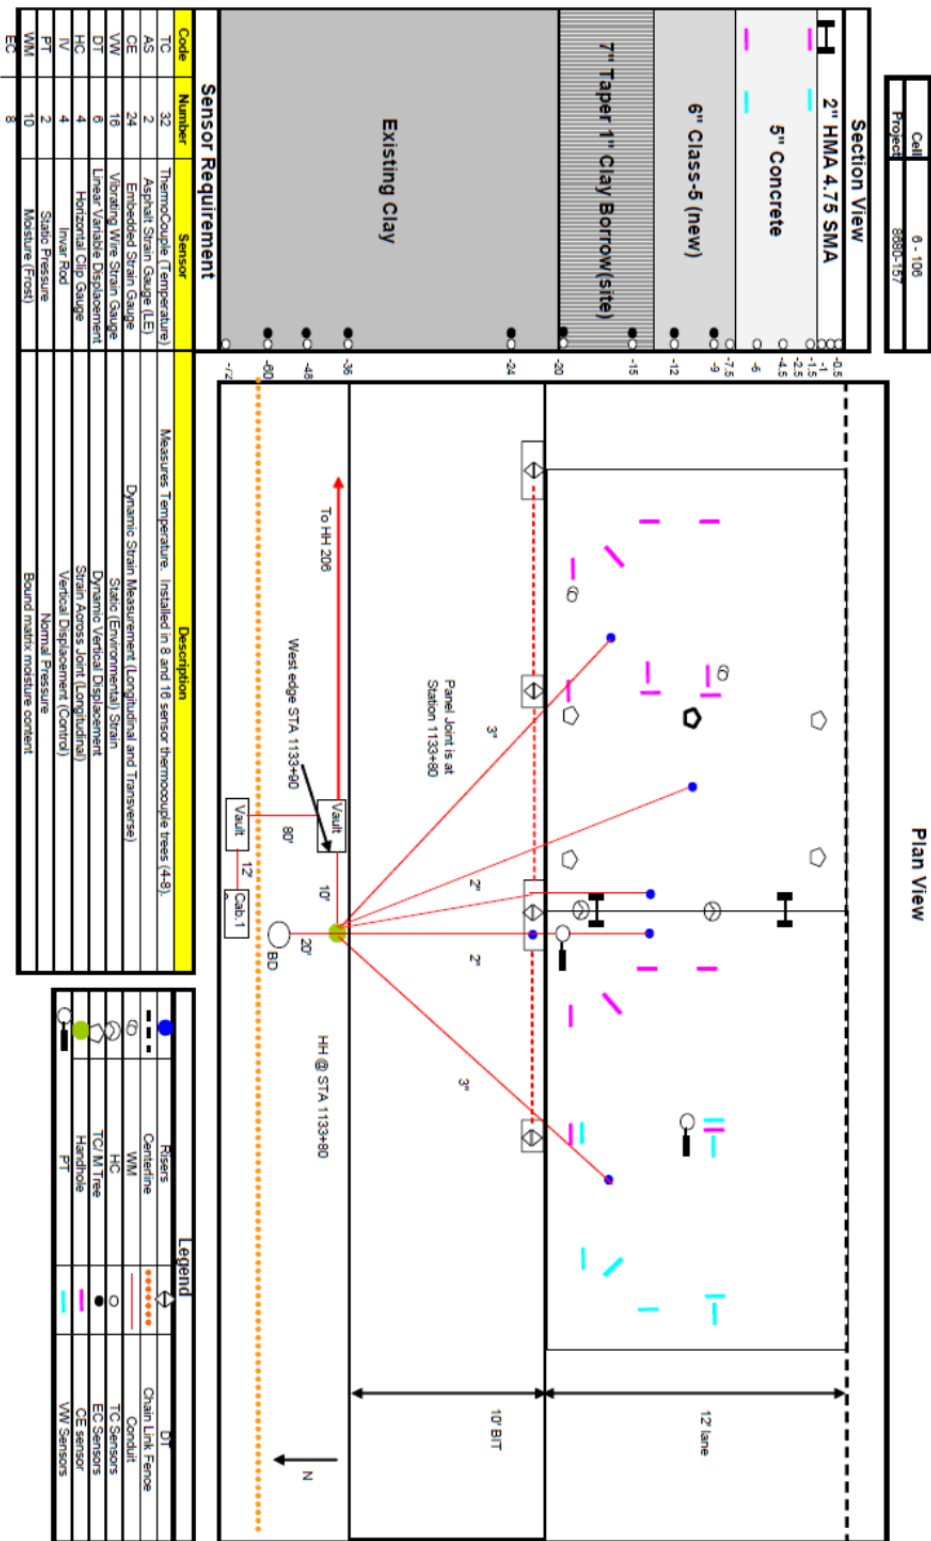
MnROAD composite pavement test layout (<http://www.dot.state.mn.us>)
